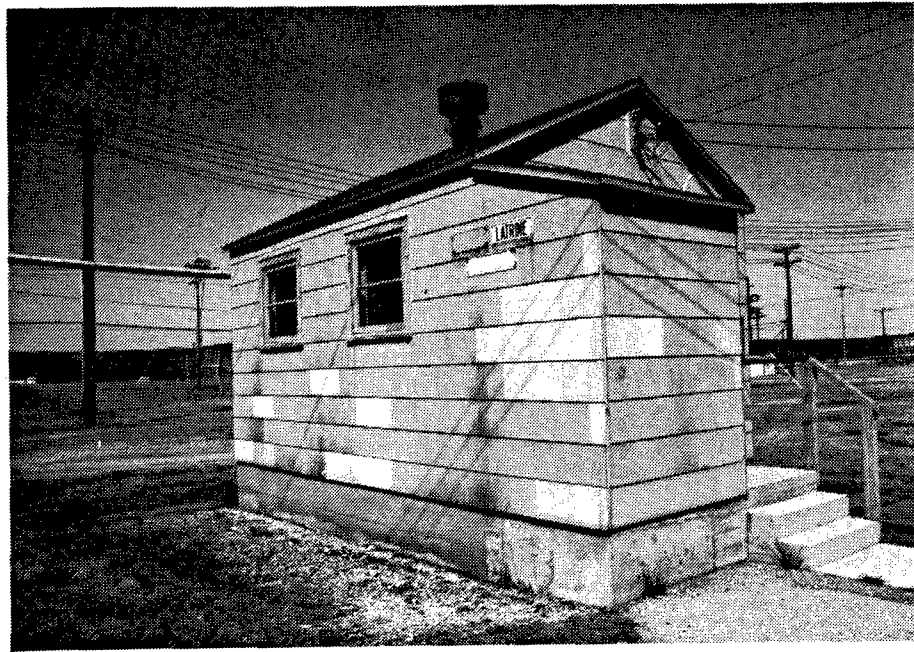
Building 4710-D1: Latrine with a shingled roof.
